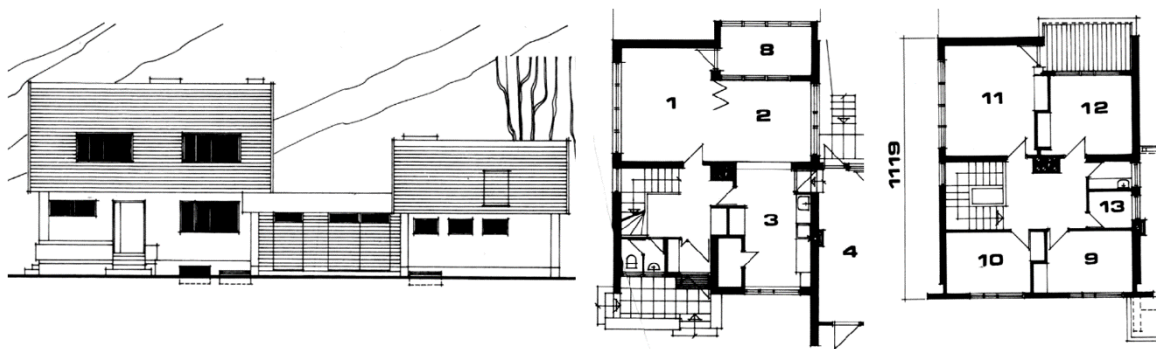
Project IE-5-06-81, example of a box house design from 1981 (left to right: elevation, ground floor, upper floor) (Asszonyi & Amjärv, 1981)
